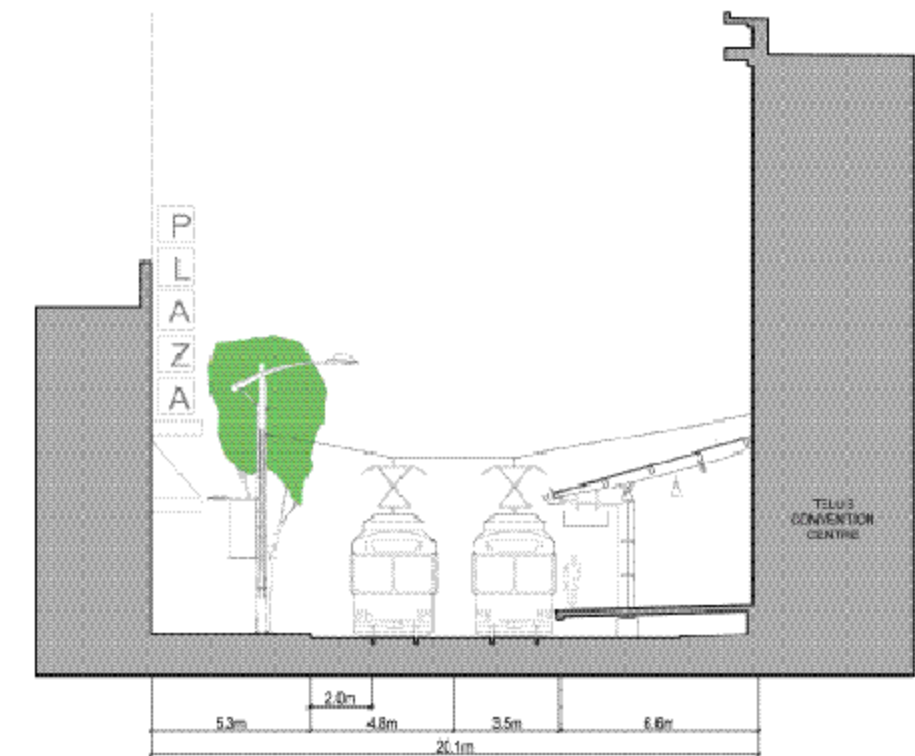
, Centre Street Station Platform adjacent to the TELUS Convention Centre
